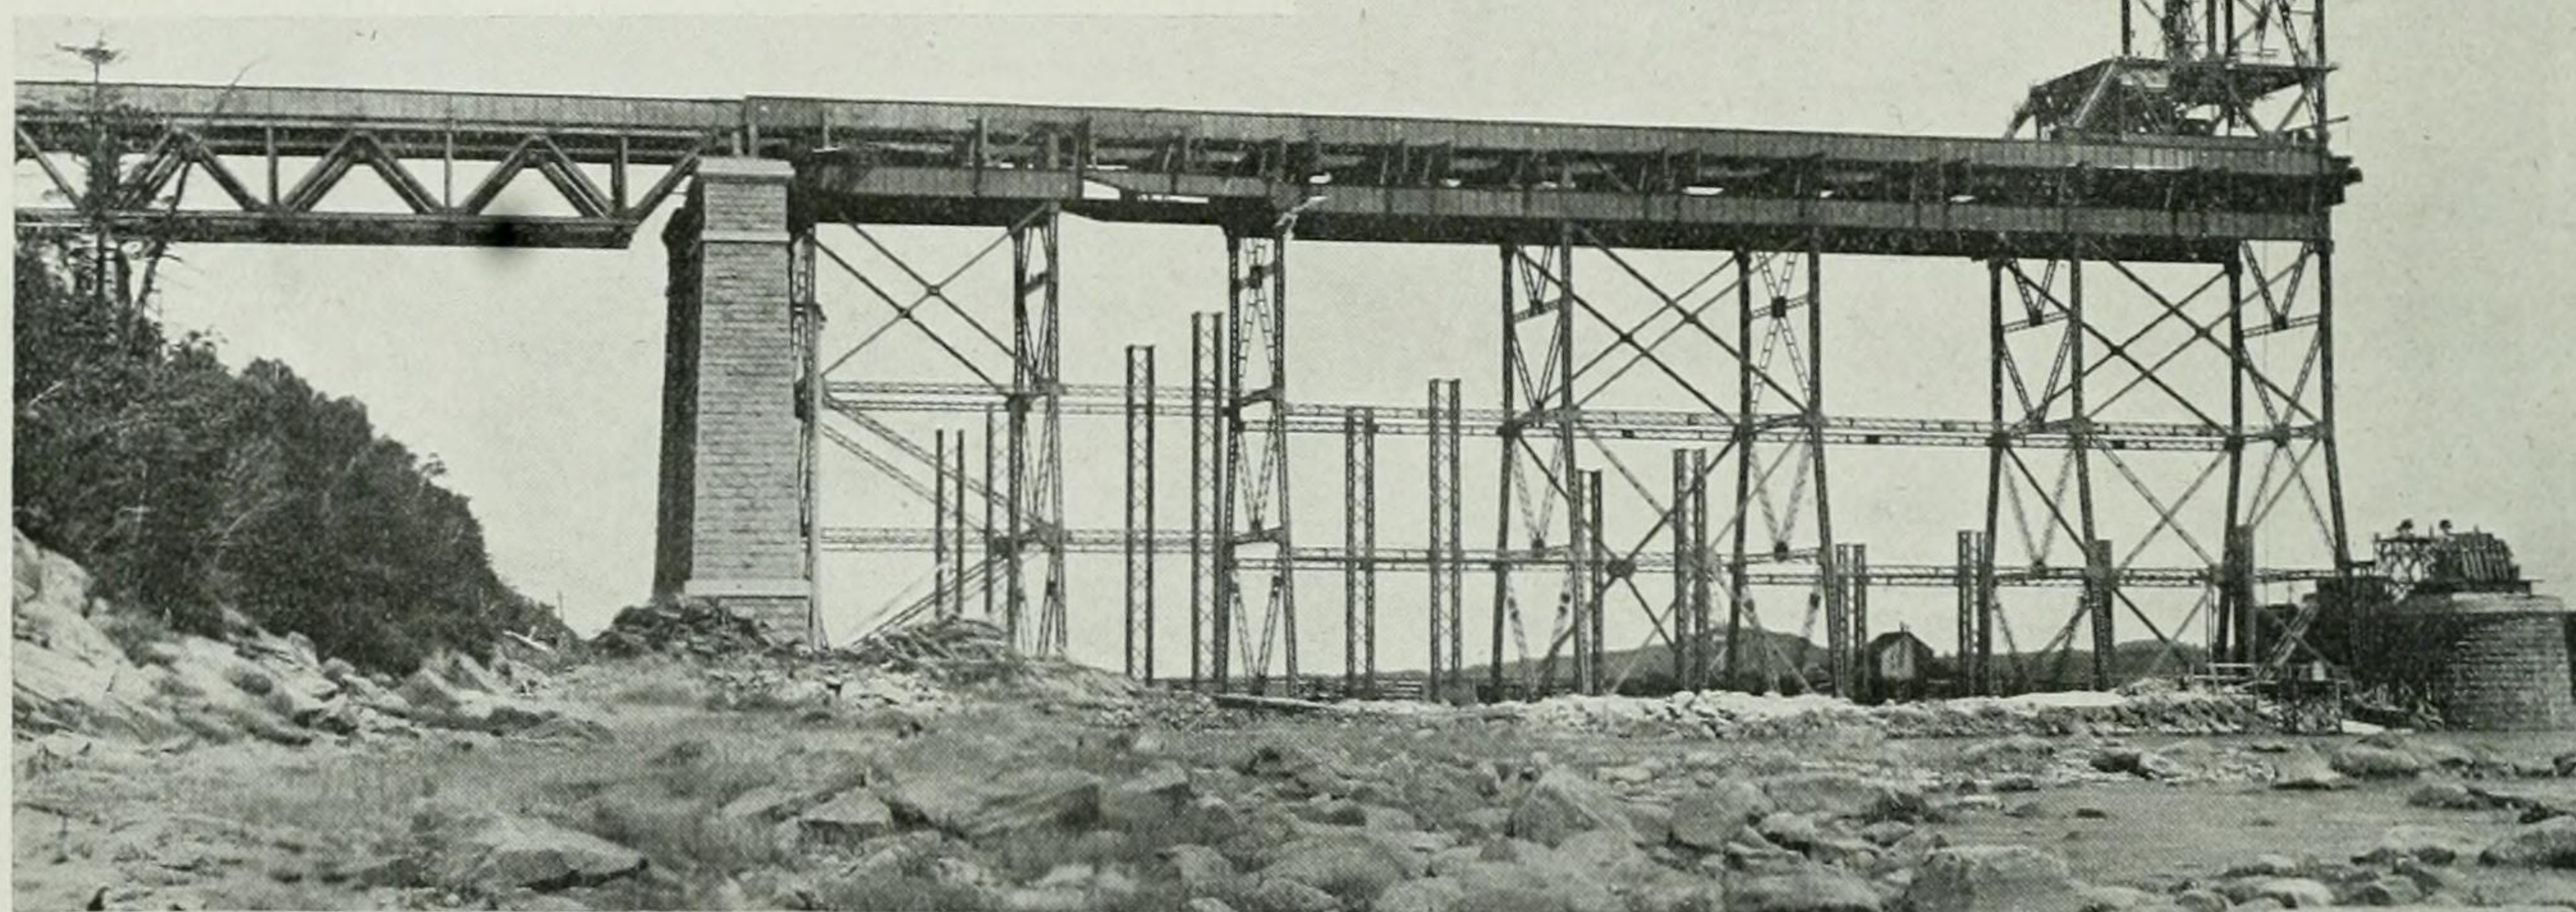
Falsework and Floor Erected, and a Start Being Made on the Erection of the Main Shoes.
